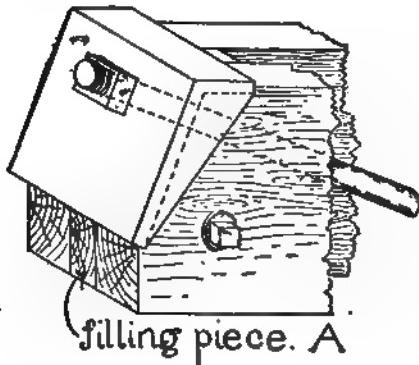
Details of "Belly-Rod" Trussed Beam.
